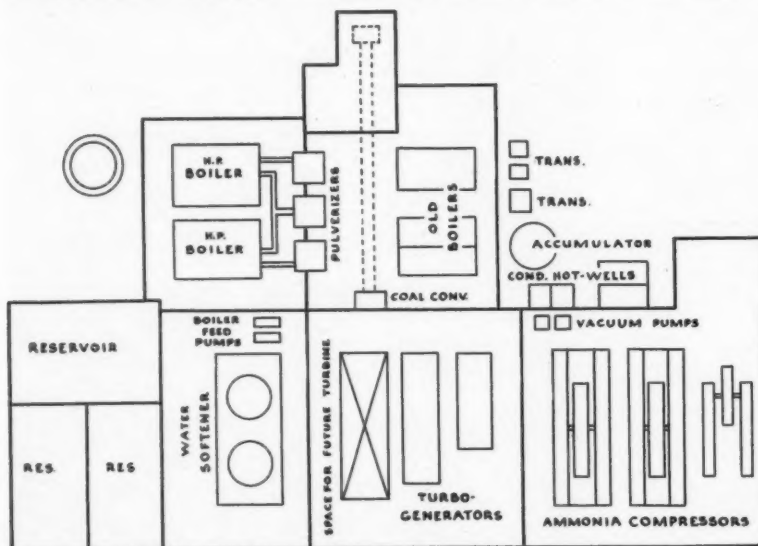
POWER DEPARTMENT LAYOUT OF THE DECKER PLANT.
